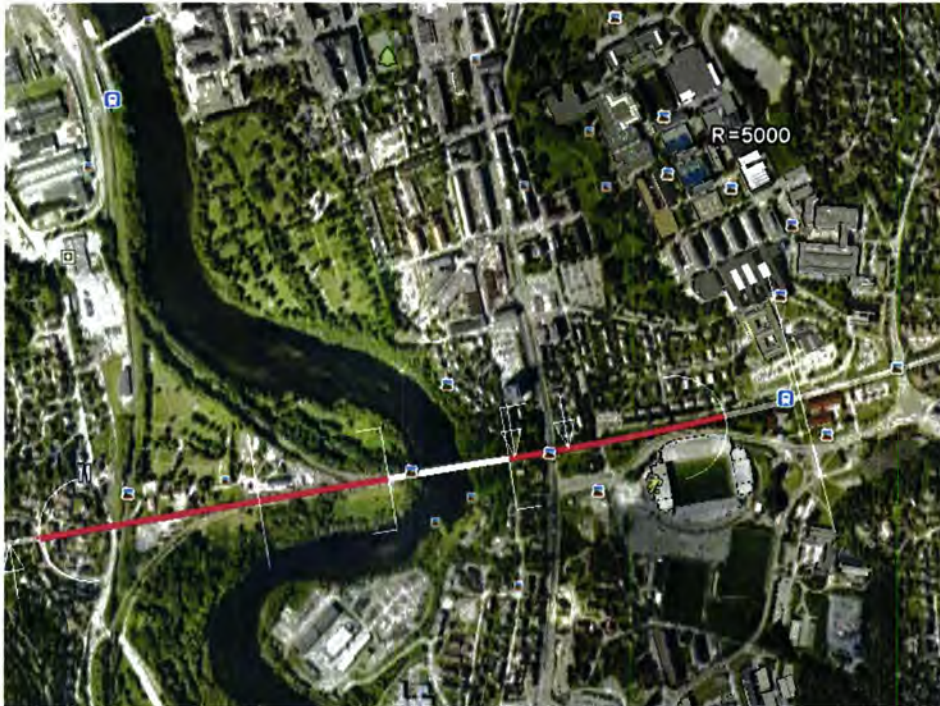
Railway bridge crossing Nidelva close to Lerkendal in Trondheim.
